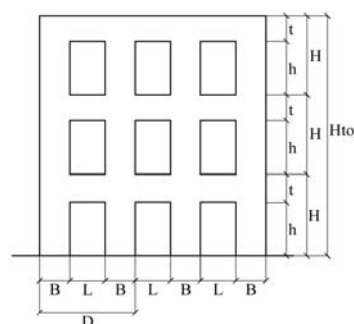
Geometrical dimensions of multi-storey masonry wall
